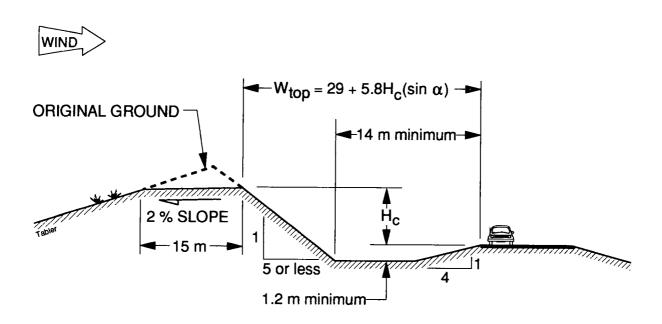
Proposed section for cuts where approaching terrain slopes upward toward the road.
